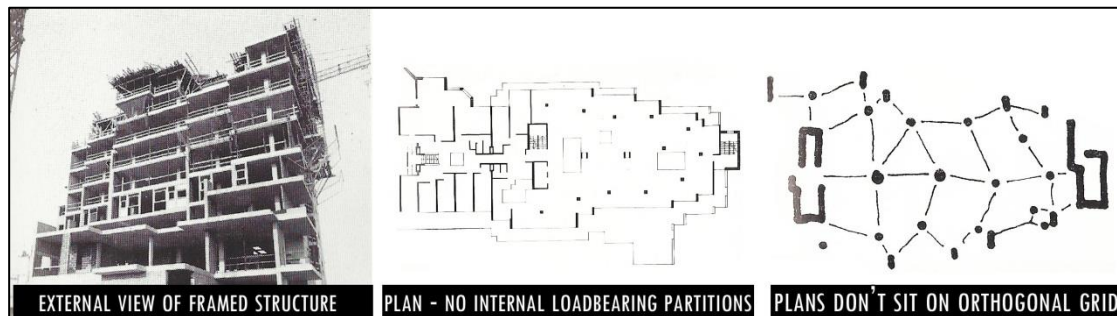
The building is a framed structure with little or no load bearing walls and the façade is independent from structure for maximum flexibility. Base Source: Wolfgang, 1988:45
